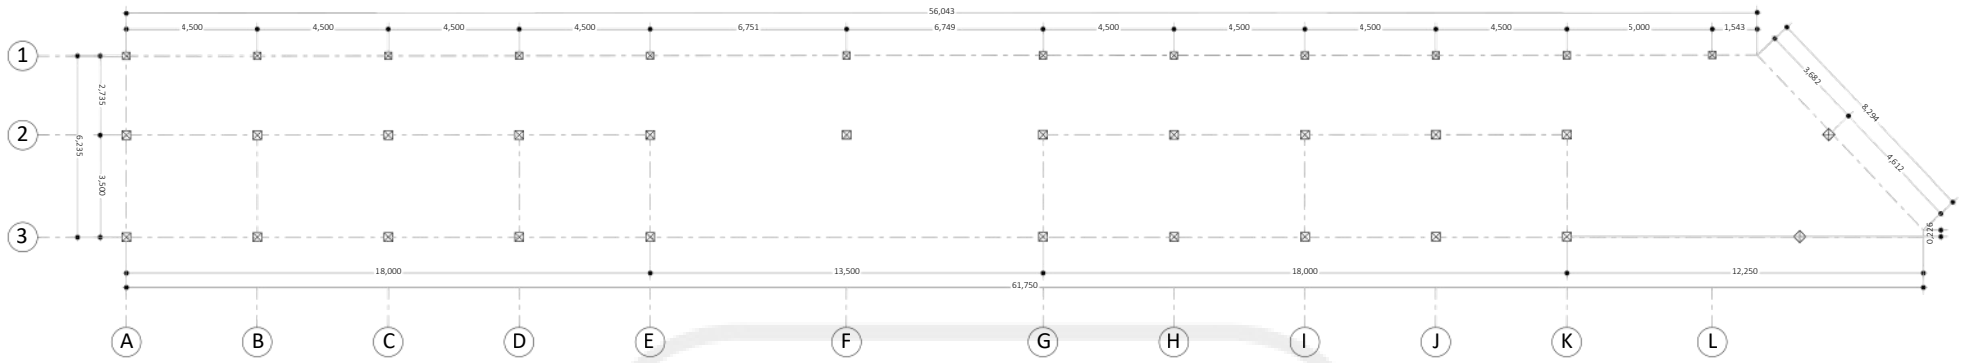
## DETAIL FLOOR PLATE AND ROOF TENANT 1
